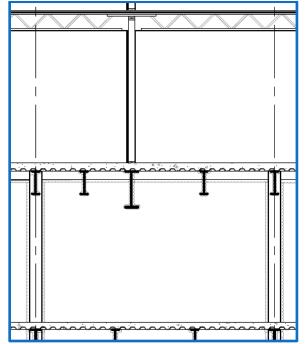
Alignment of Bearing Wall and Steel Beam (Architect)
